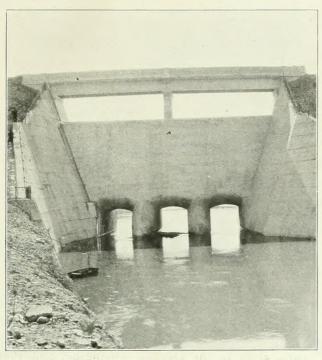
HUFFMAN SPILLWAY AND BRIDGE, MARCH 22, 1922.
